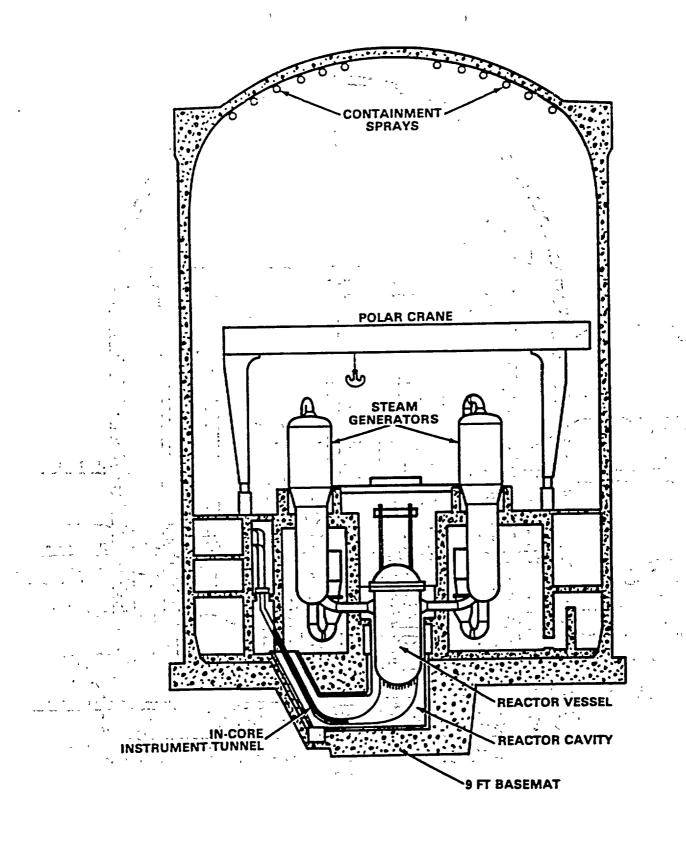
Zion Large, Dry Containment (Post-Tensioned Concrete with Steel Liner)
